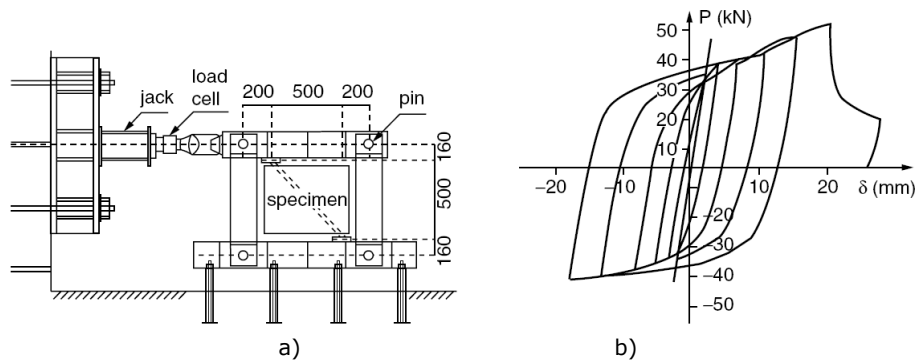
Sub-assembly test of BRB sandwiched between precast concrete panels a) Test setup; b) hysteretic behavior [30]
